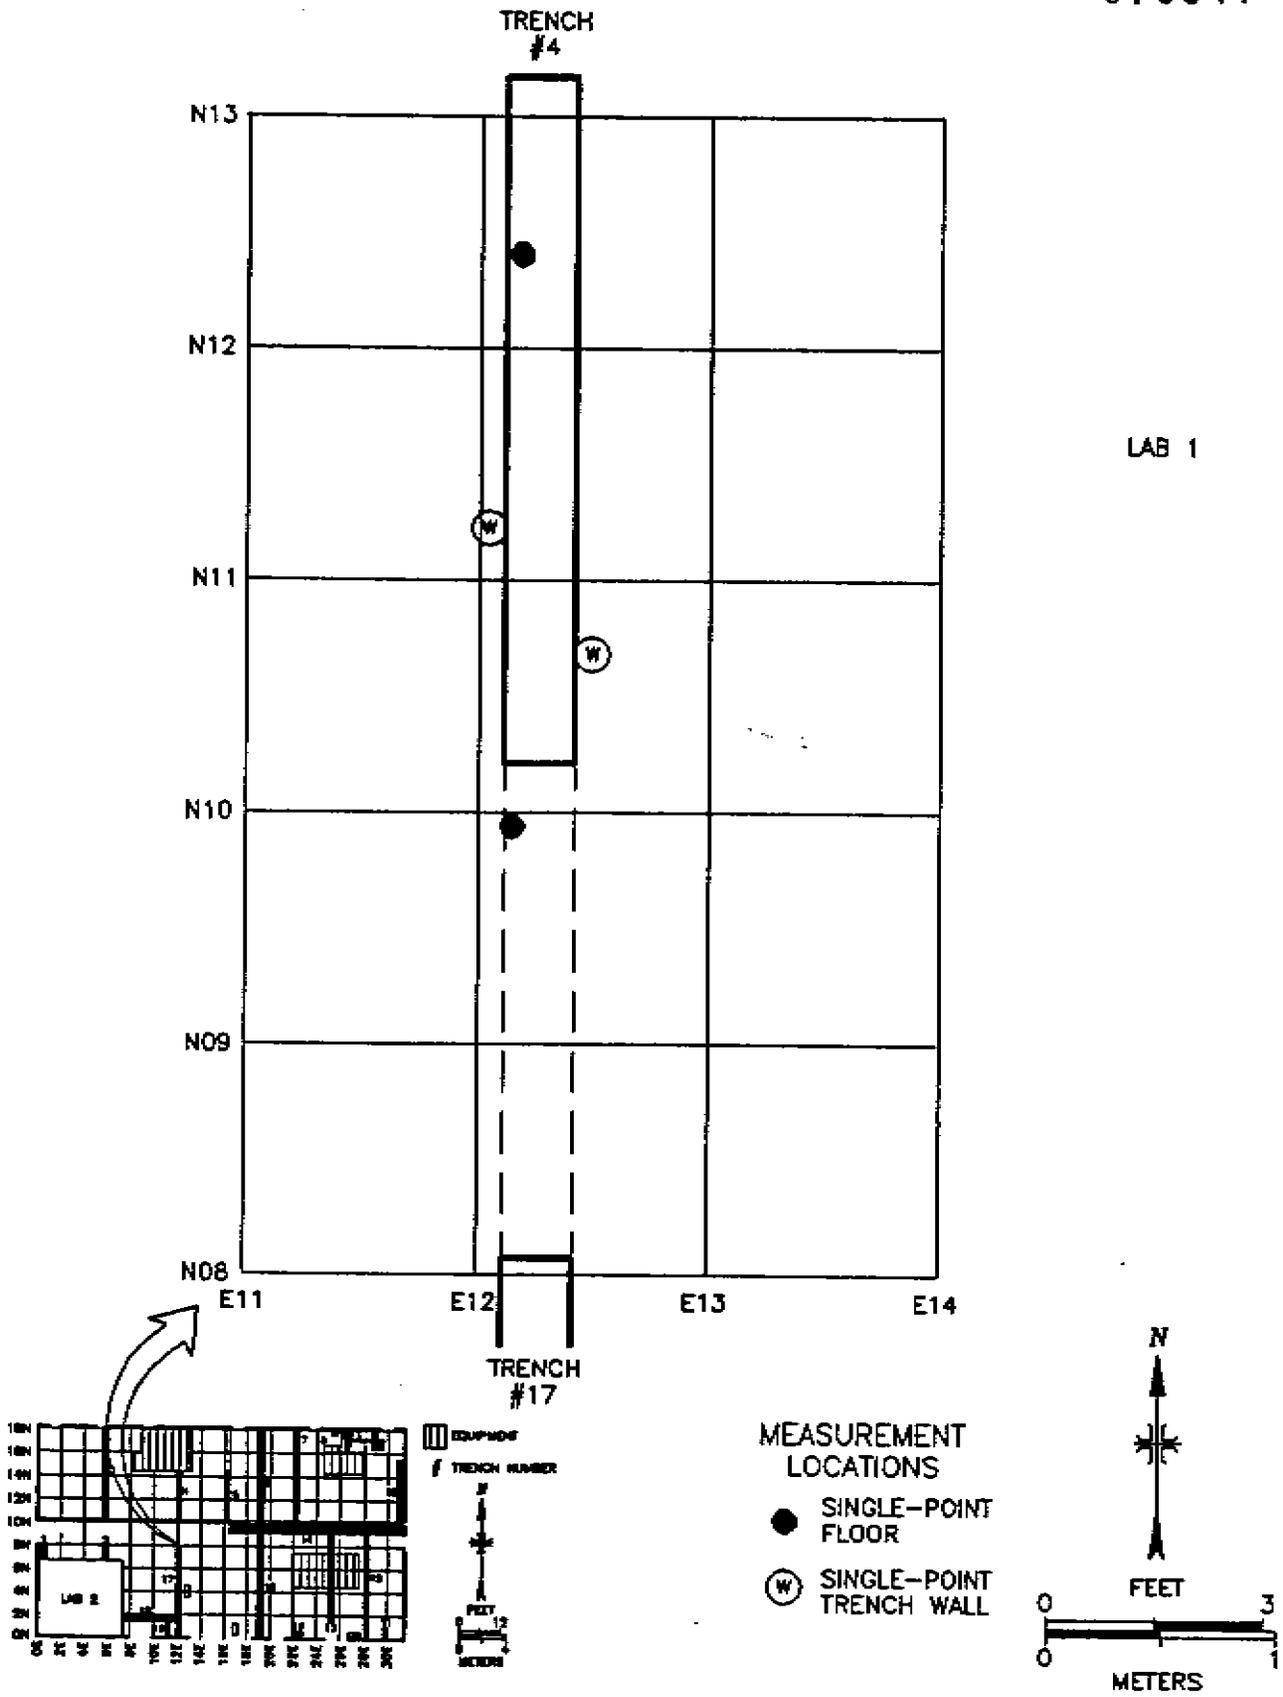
Building 23, Lab 1, Trench 4, Indicating Measurement Locations
